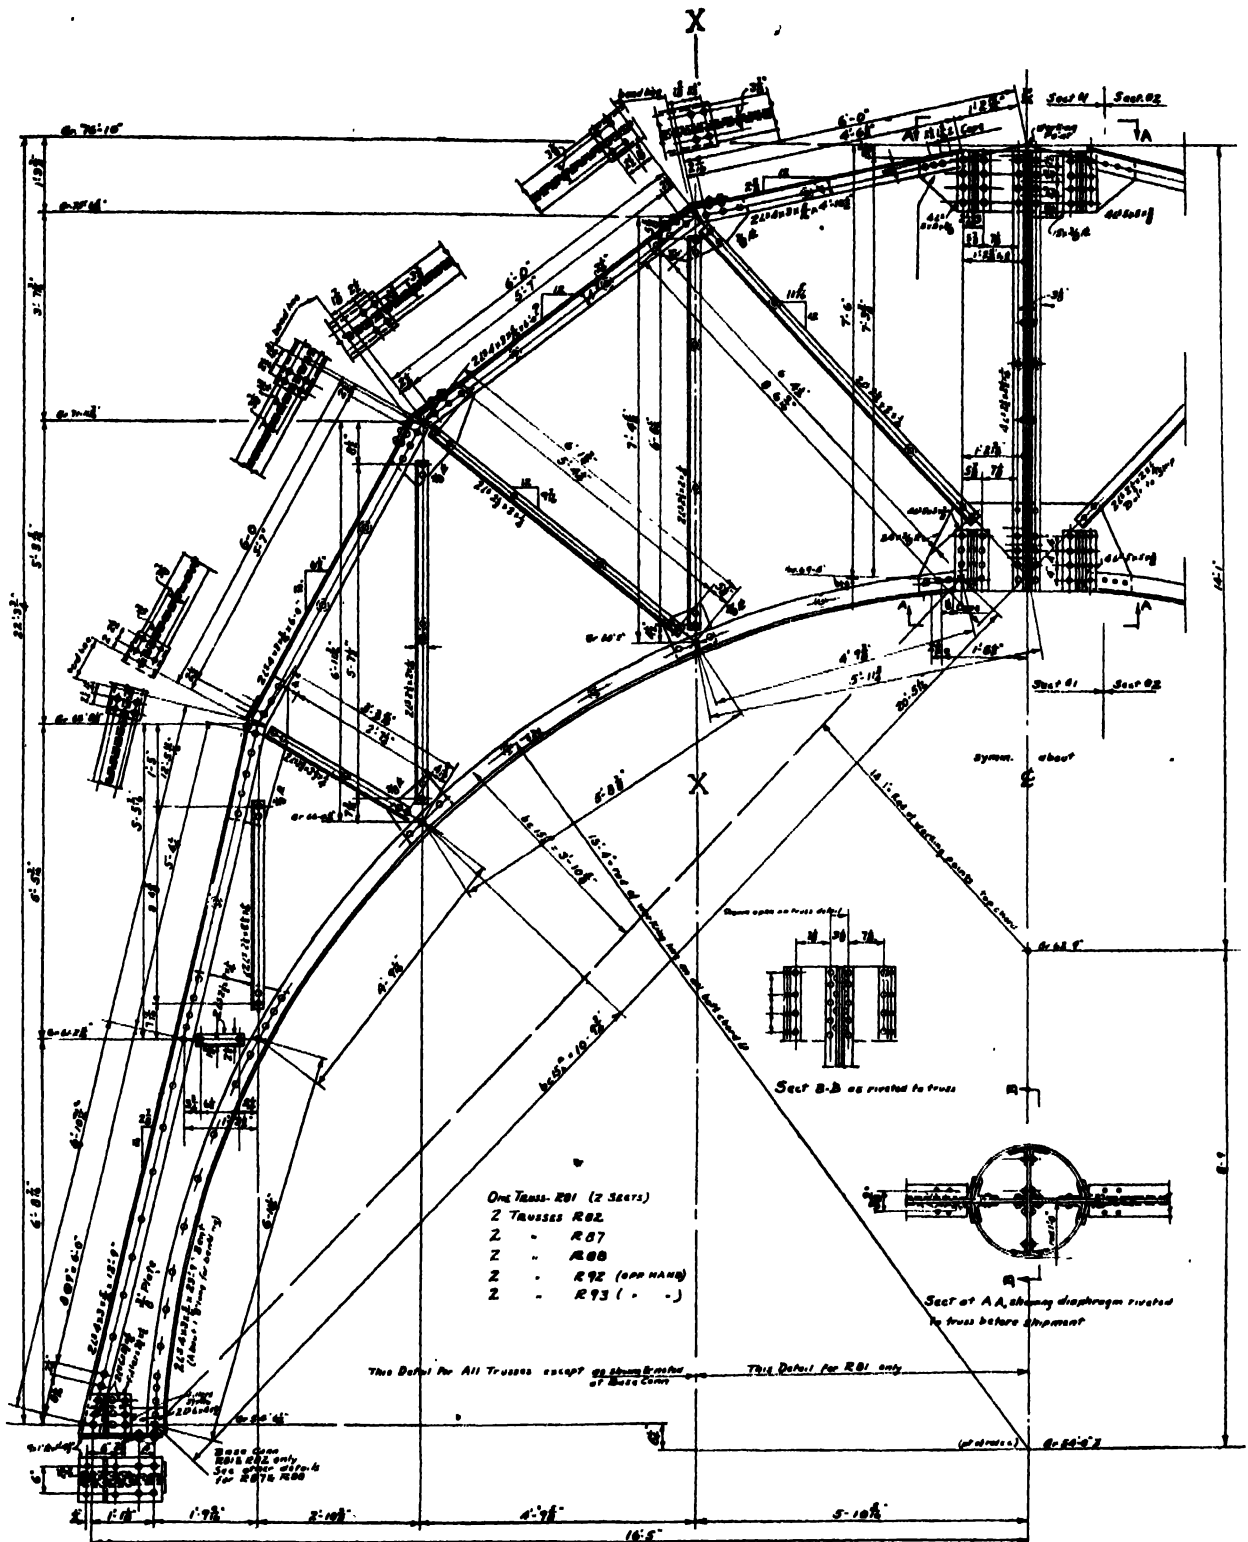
TYPICAL DETAILS OF A DOME TRUSS
